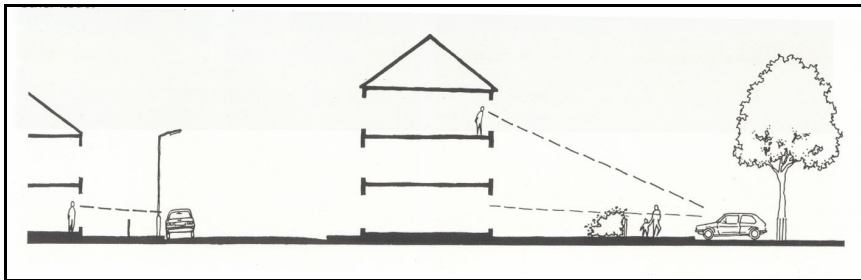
In the interests of security car parking should be overlooked by buildings where possible
